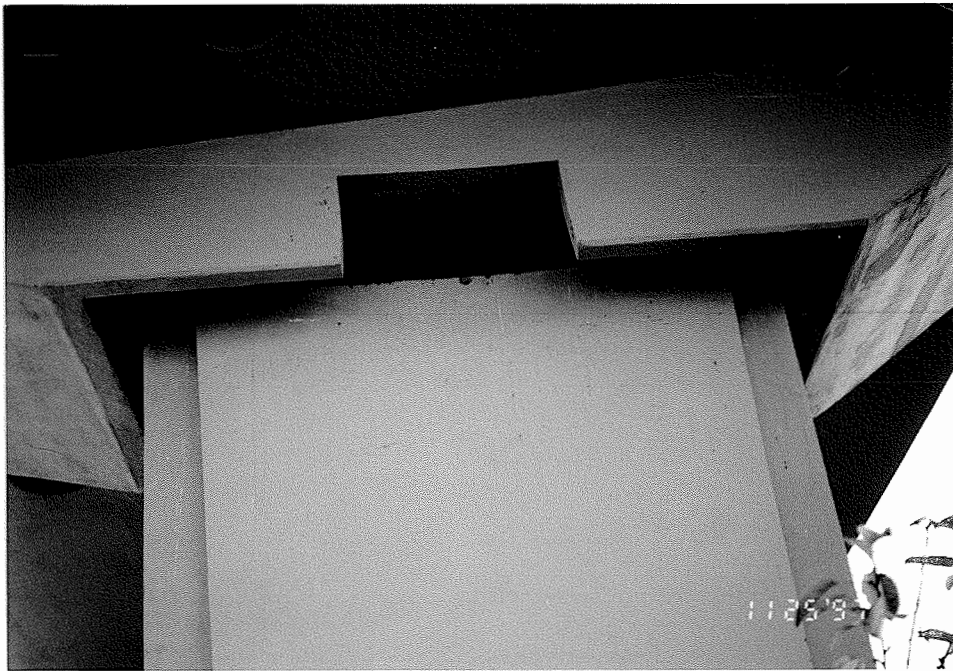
An inspection access for the base isolation bearings at the top of a column on Bridge #9669A.
